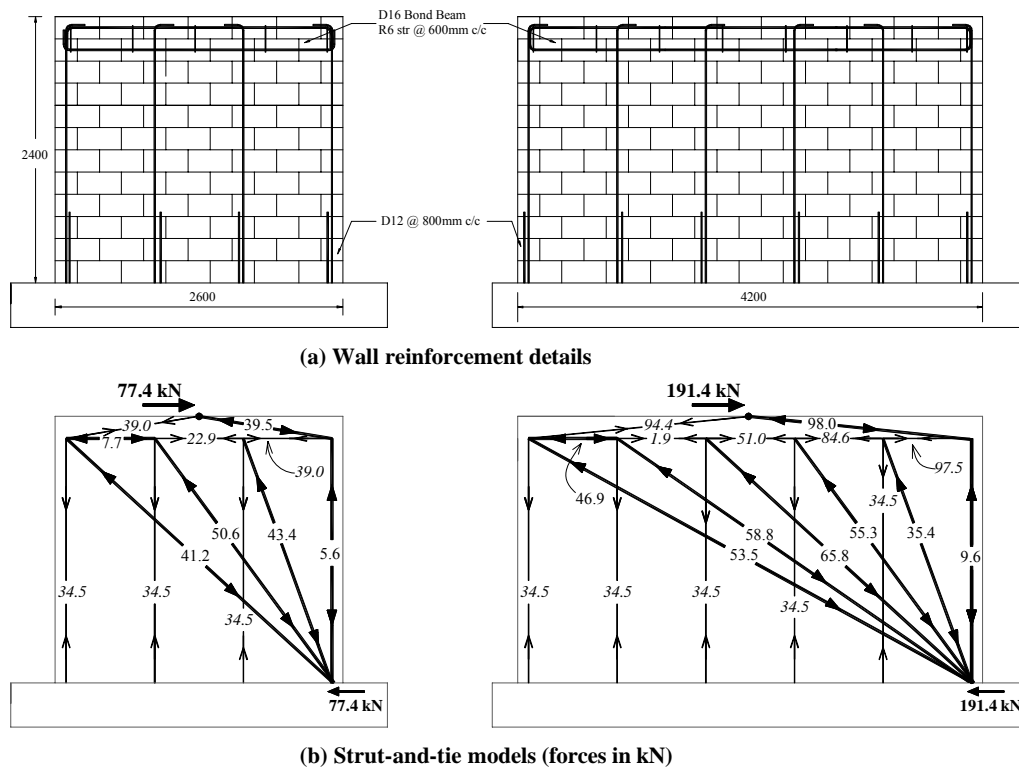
Strut-and-tie models for masonry walls without opening.
